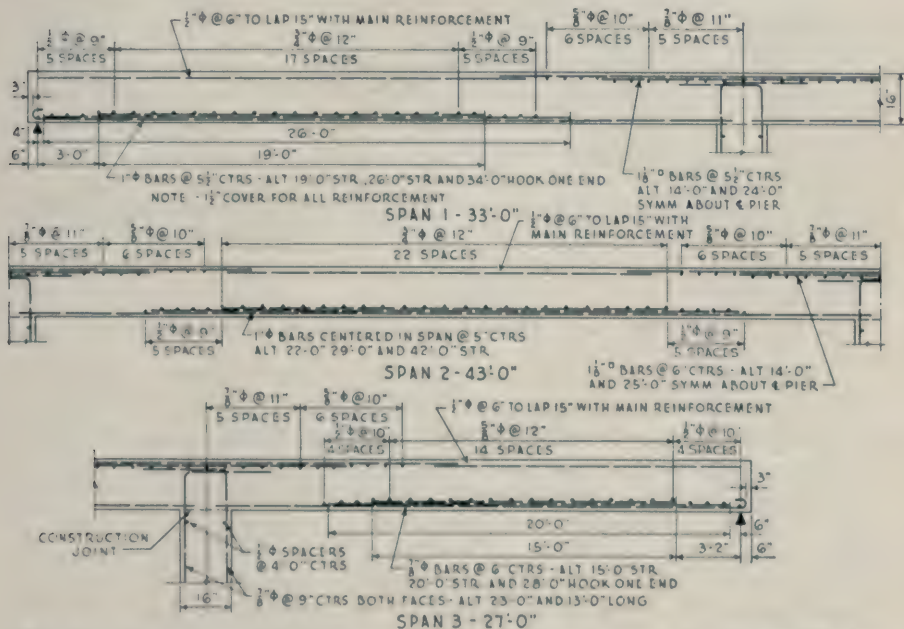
Arrangement of reinforcement in deck and piers of bridge of Design Problem No. 2.
